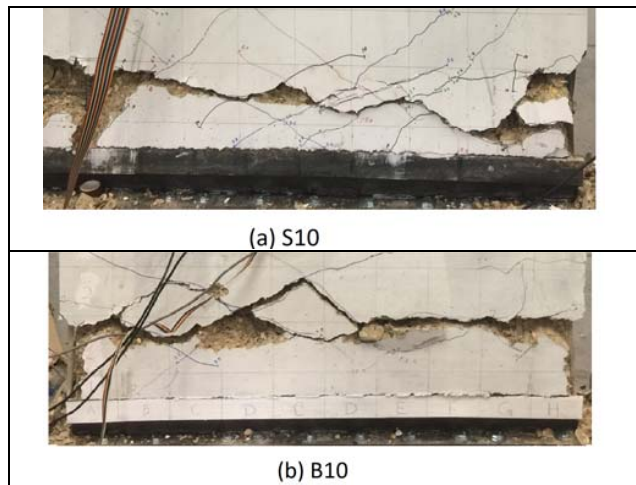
Cracking and crushing photos for (a) S10, (b) B10 samples
